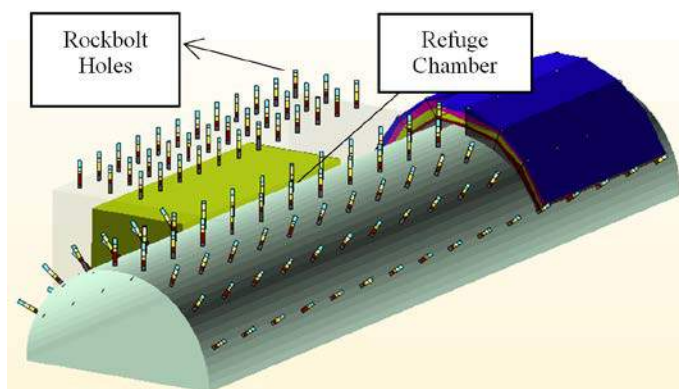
Refuge chamber and rockbolt holes showing roof rock layers in tunnel
